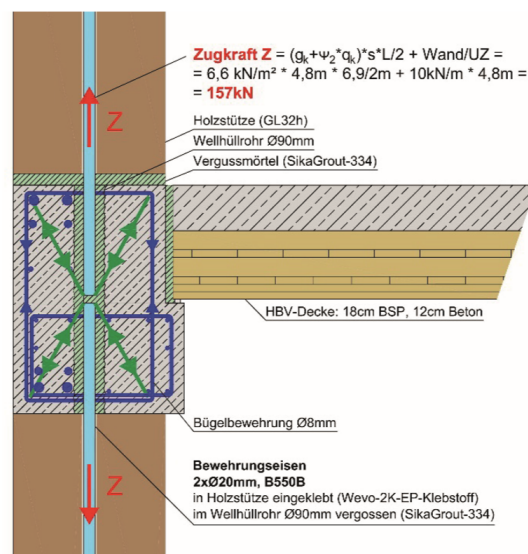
Illustration of the structural concept in HoHo Vienna. A timber hybrid structure that is attached to a concrete core (Woschitz and Zotter, 2017). Images © RWT plus ZT GmbH
